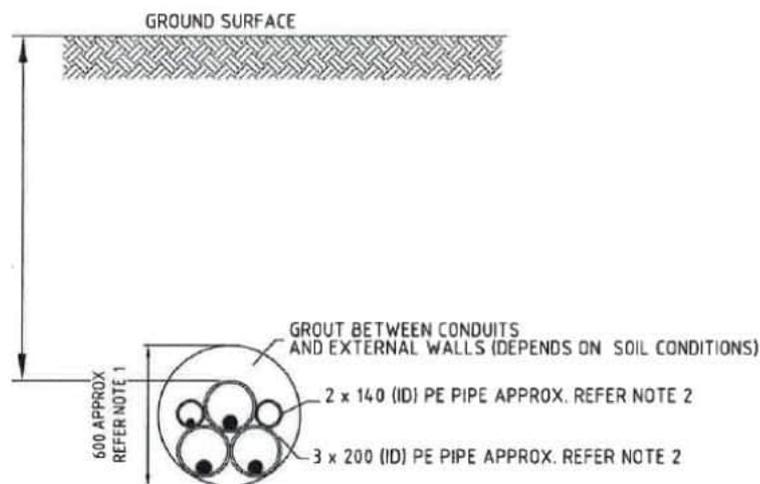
Typical underbore cross section (Endeavour Energy, 2022)
